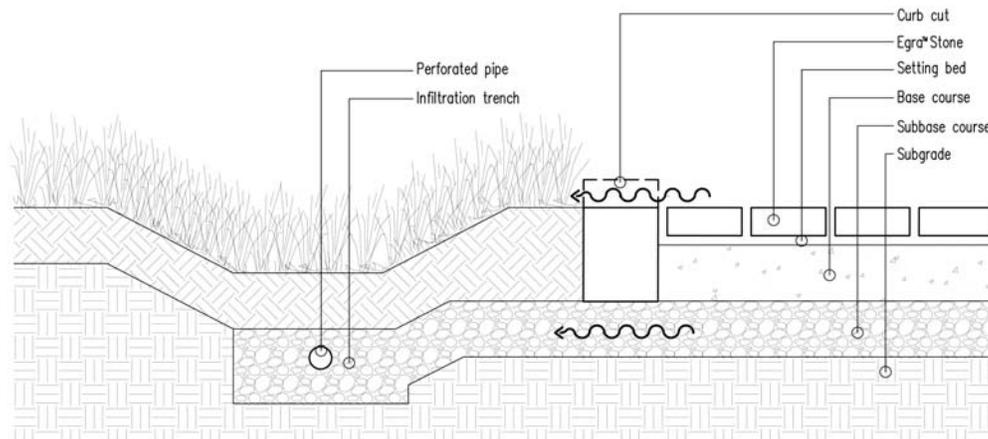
Drainage of porous pavement into Bioswale with Infiltration Trench
